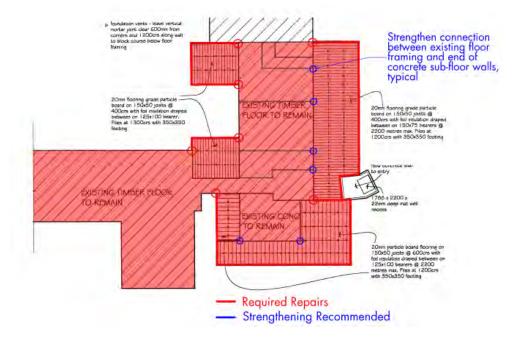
South Wing – Foundation / Ground Floor Plan -Strengthening Recommended
